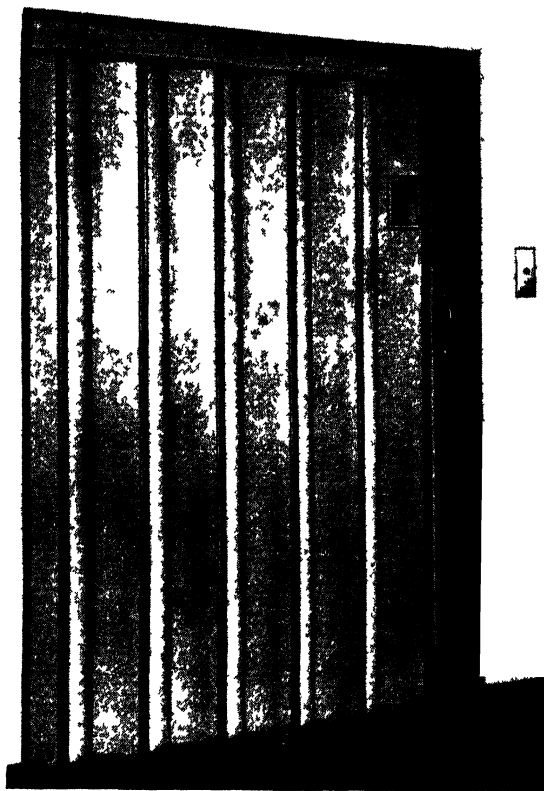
COLLAPSIBLE SHIFT SHUTTER DOOR
